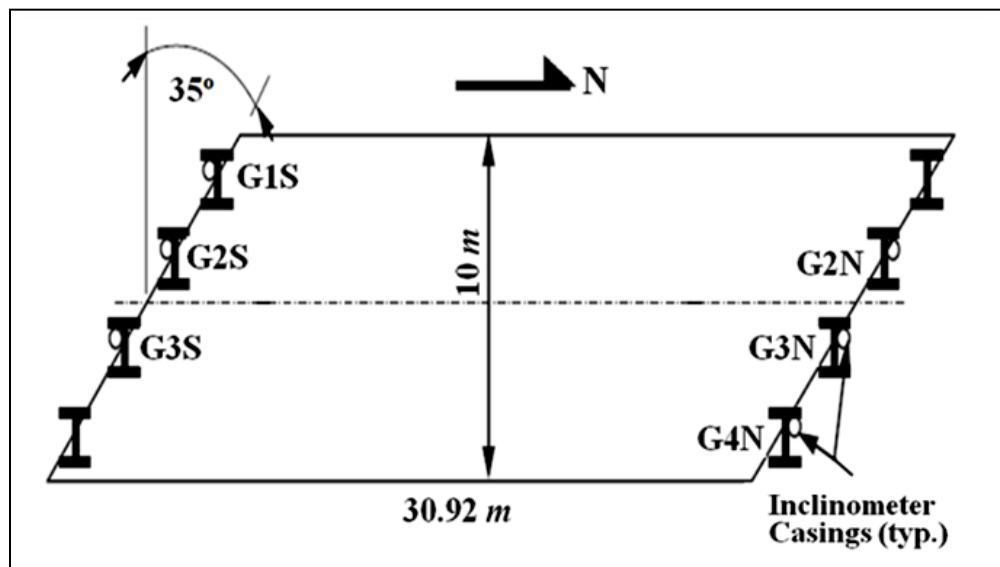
Plan view of bridge showing thermistors and instrumented piles [31].
